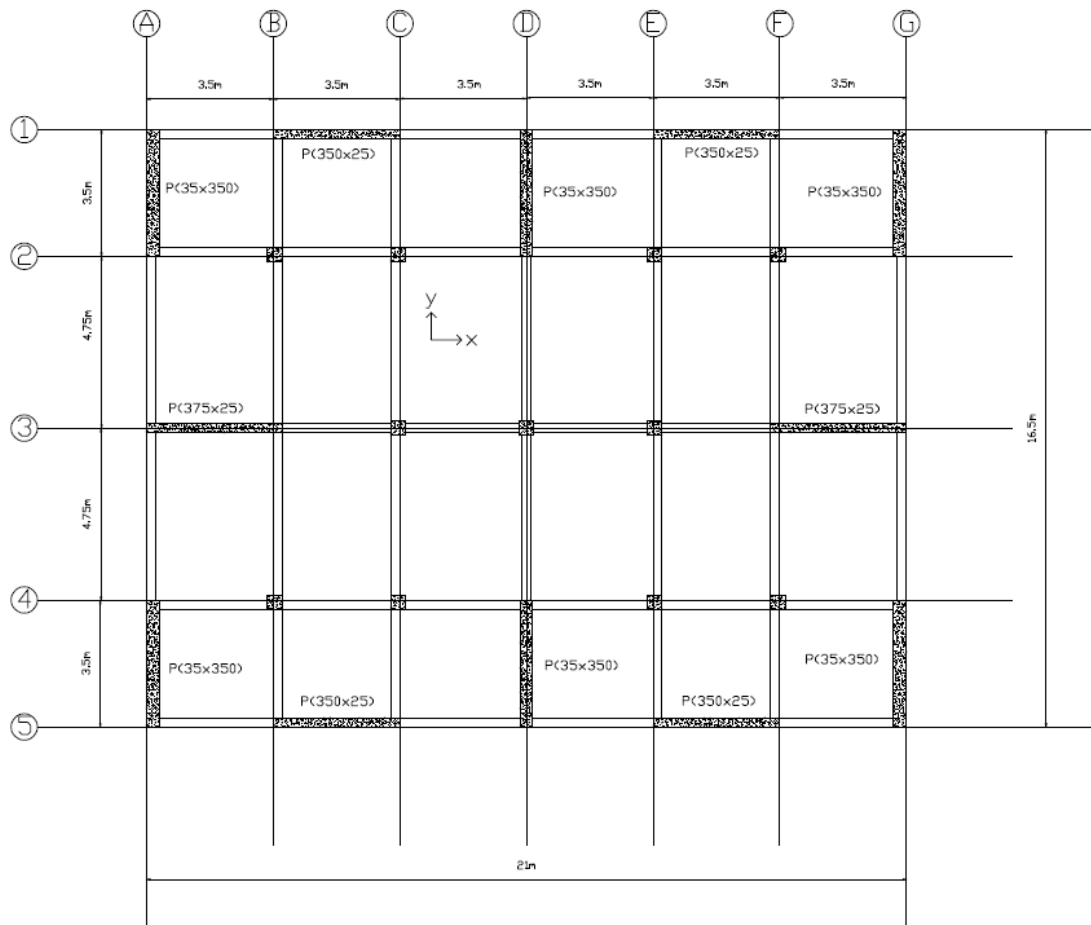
Plan of Model 9 with Wall Area to Floor Area Ratio of 1.5% in X-direction and 2.0% in Y-direction
